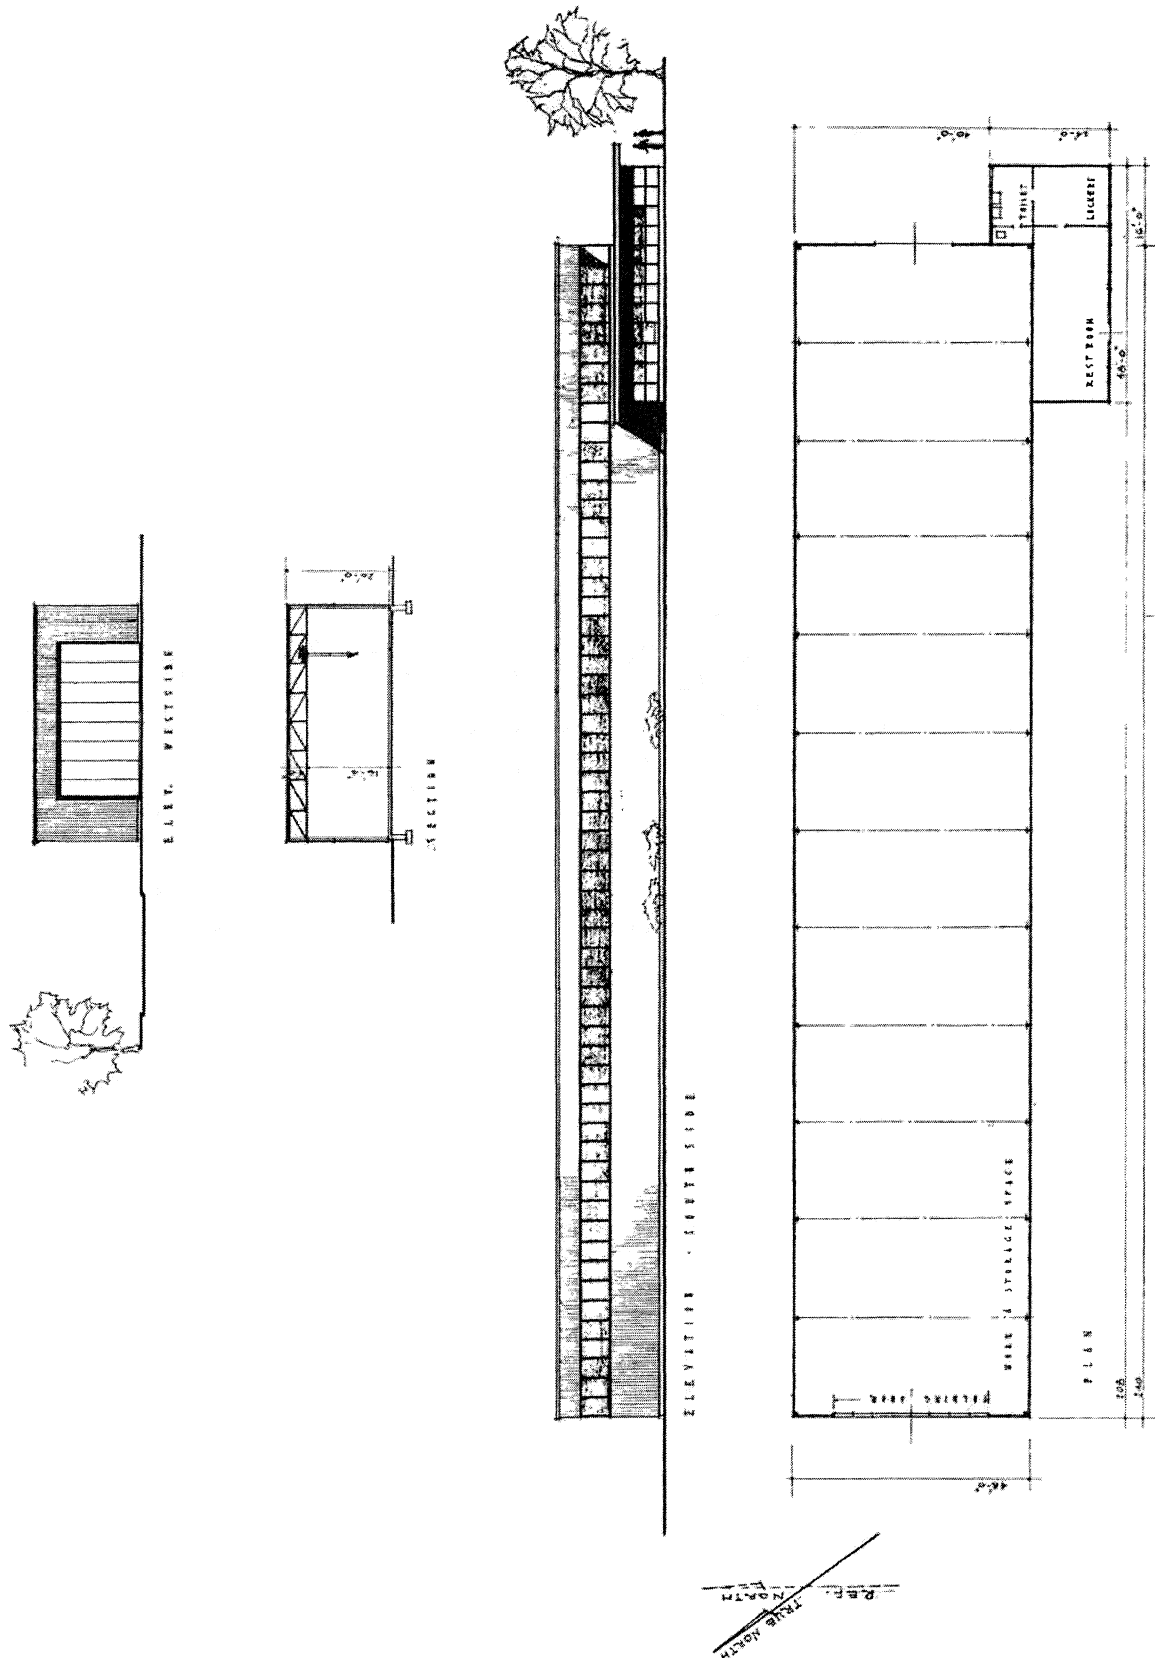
Plan and Elevation for the Proposed Radio Telescope Maintenance Building as Prepared by Eggers & Higgins Architects of New York City.
